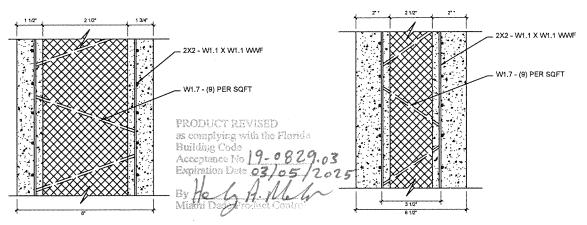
MAXIMUM RSG 3-D STRUCTURAL PANEL SECTION
